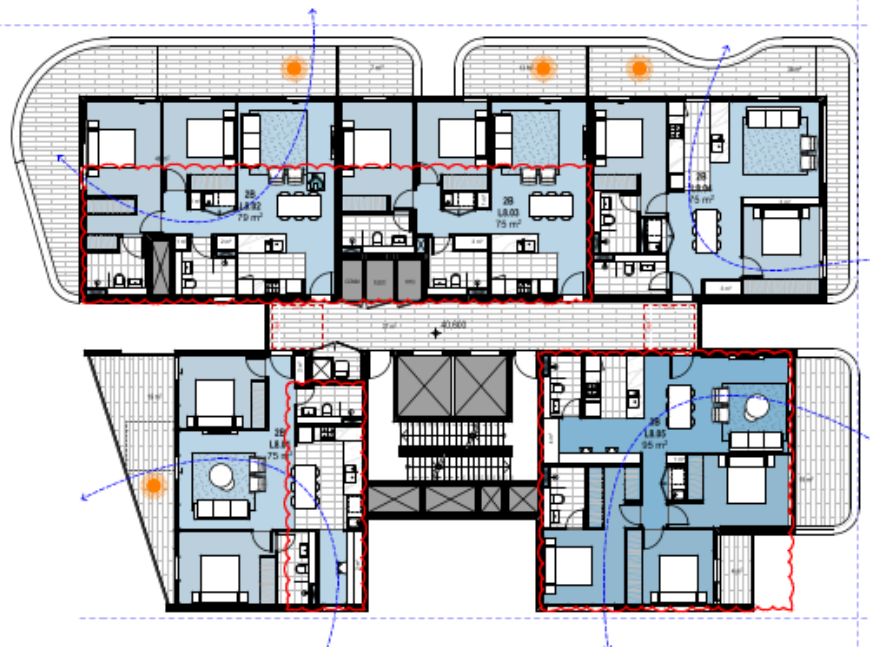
Extract of the proposed floor plan of Levels 8-10 in the current modification application.
